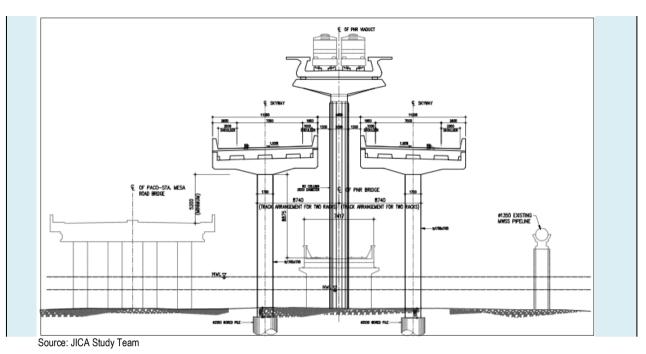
LRT & Expressway Section at Pasig Split Section
